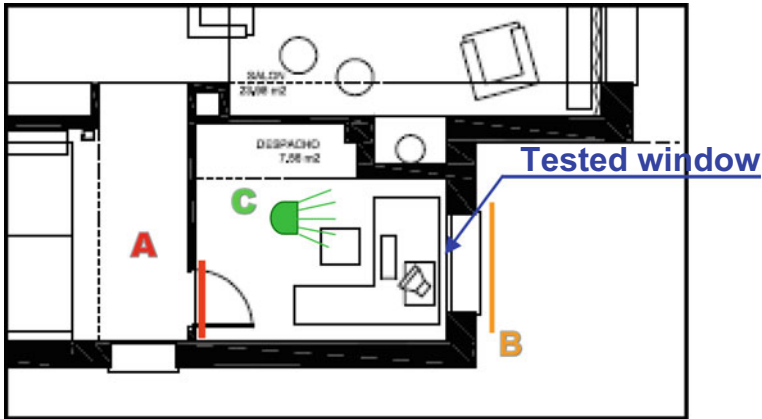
Plan sketch of the room tested: (A) blowerdoor; (B) water spray instrumentation, and (C) infrared camera
